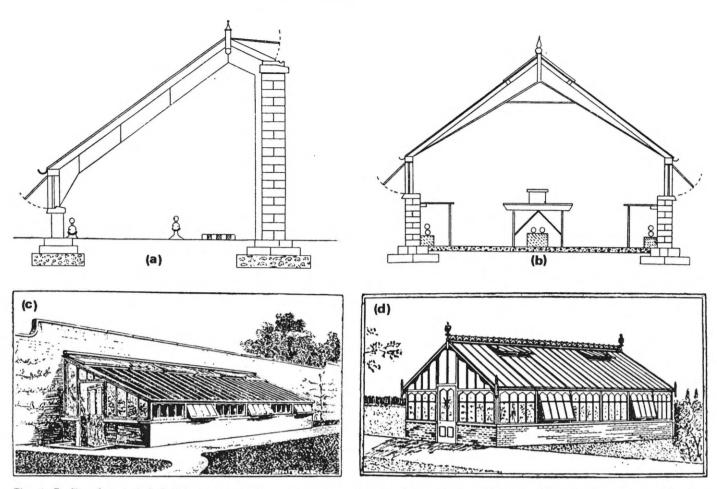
Profile of a typical British lean-to glasshouse (a), a span-roofed plant house (b). From Newsham 1908. A lean-to glasshouse (c) and a span-roofed conservatory (d) illustrated in Murphy's "Gardening in New Zealand" 1907 are clearly based on British models.
